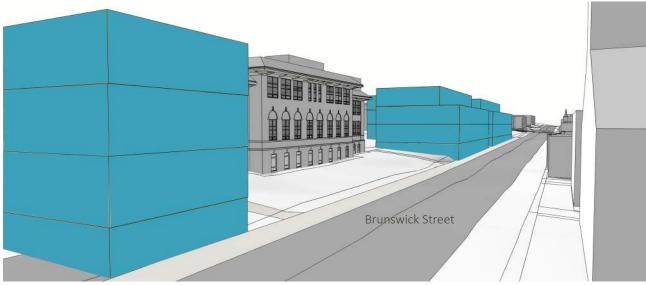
Frontage on Brunswick Street after development (New building envelopes shown in blue)
